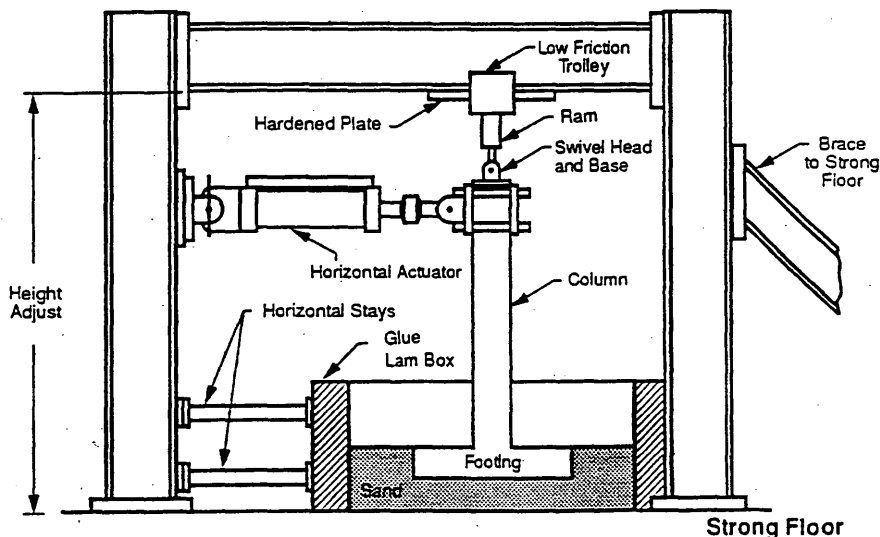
Testing setup (1 kip = 4.448 kN; 1 in. = 25.4 mm; 1 ft = 0.304 m).
